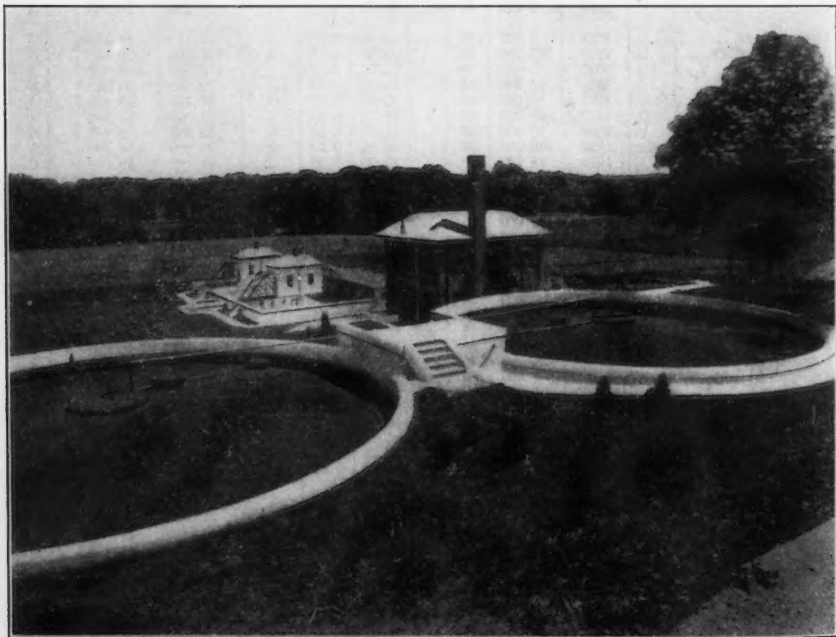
TYPICAL INSTALLATION OF SLUDGE DIGESTION TANKS WITH FLOATING COVERS, AT ELYRIA, OHIO
